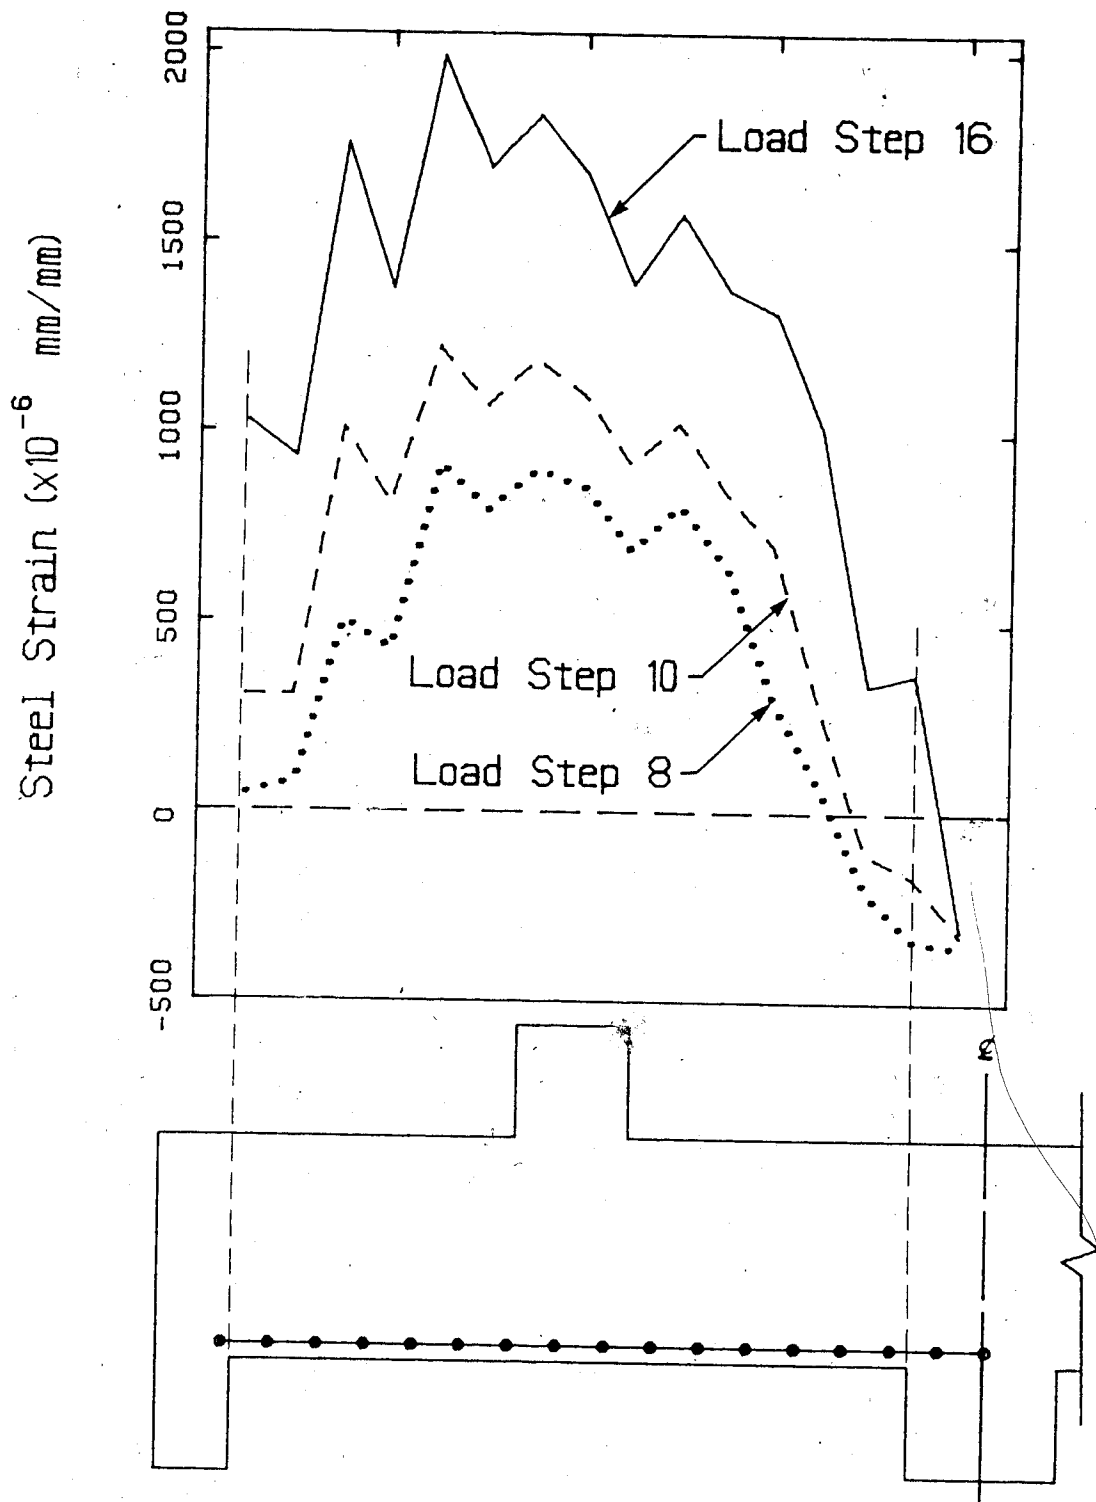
Typical Steel Strain Distribution in the Positive Moment Flexural Reinforcement, North Span of Beam No. 4
